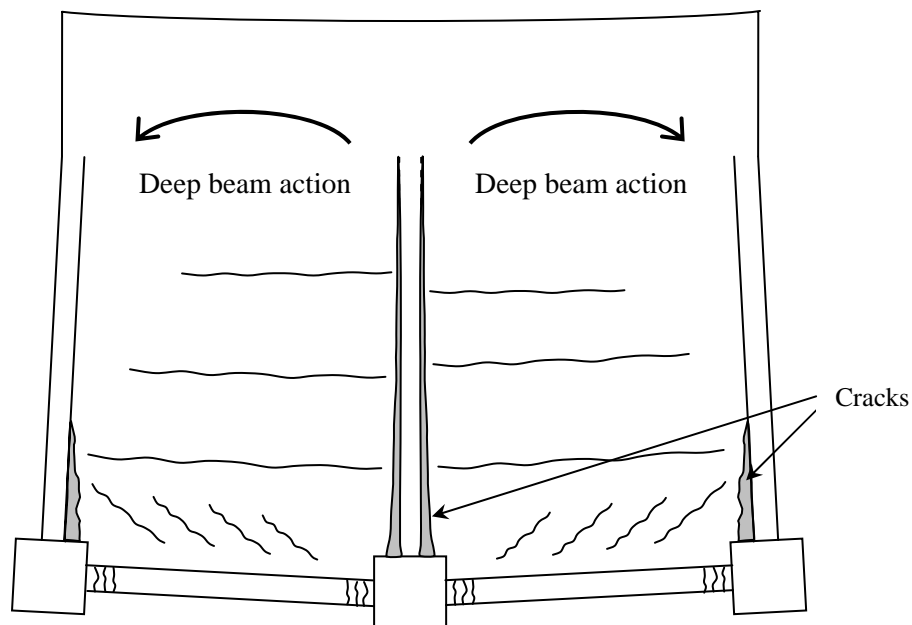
Deep beam action of floor slab restraining elongation of interior plastic hinges
